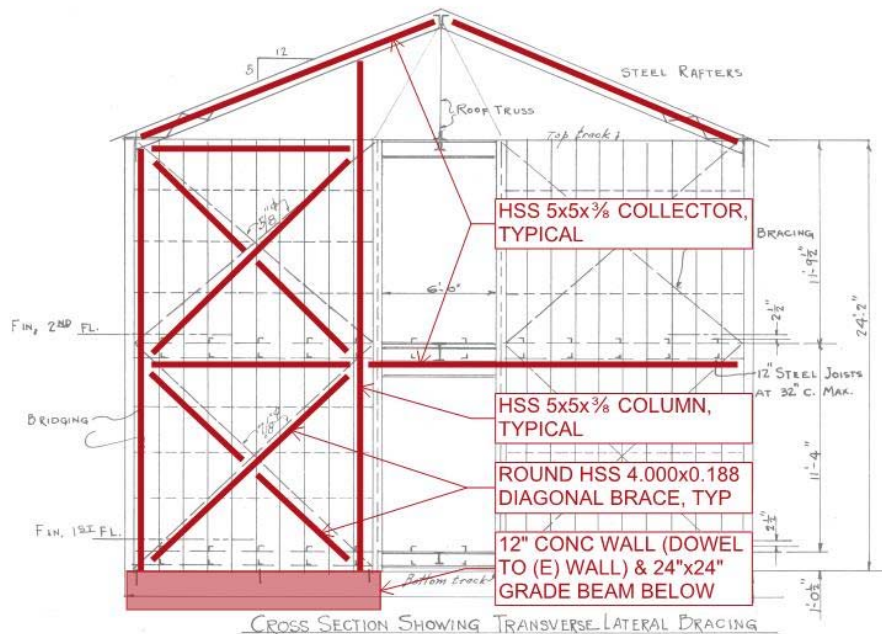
Recommended new lateral force resisting system to be installed within the building.
